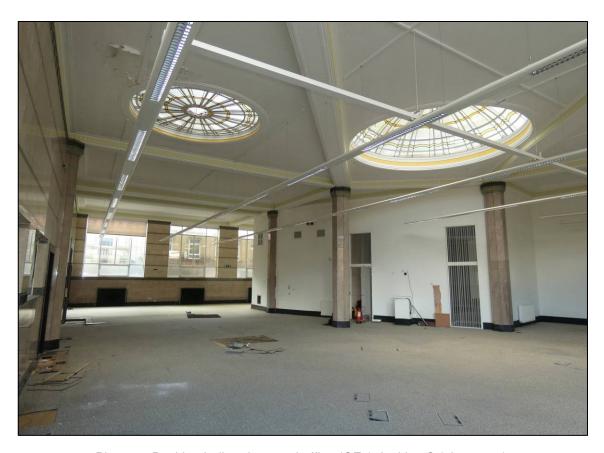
Banking hall and general office (GF2), looking S (photo 816).
